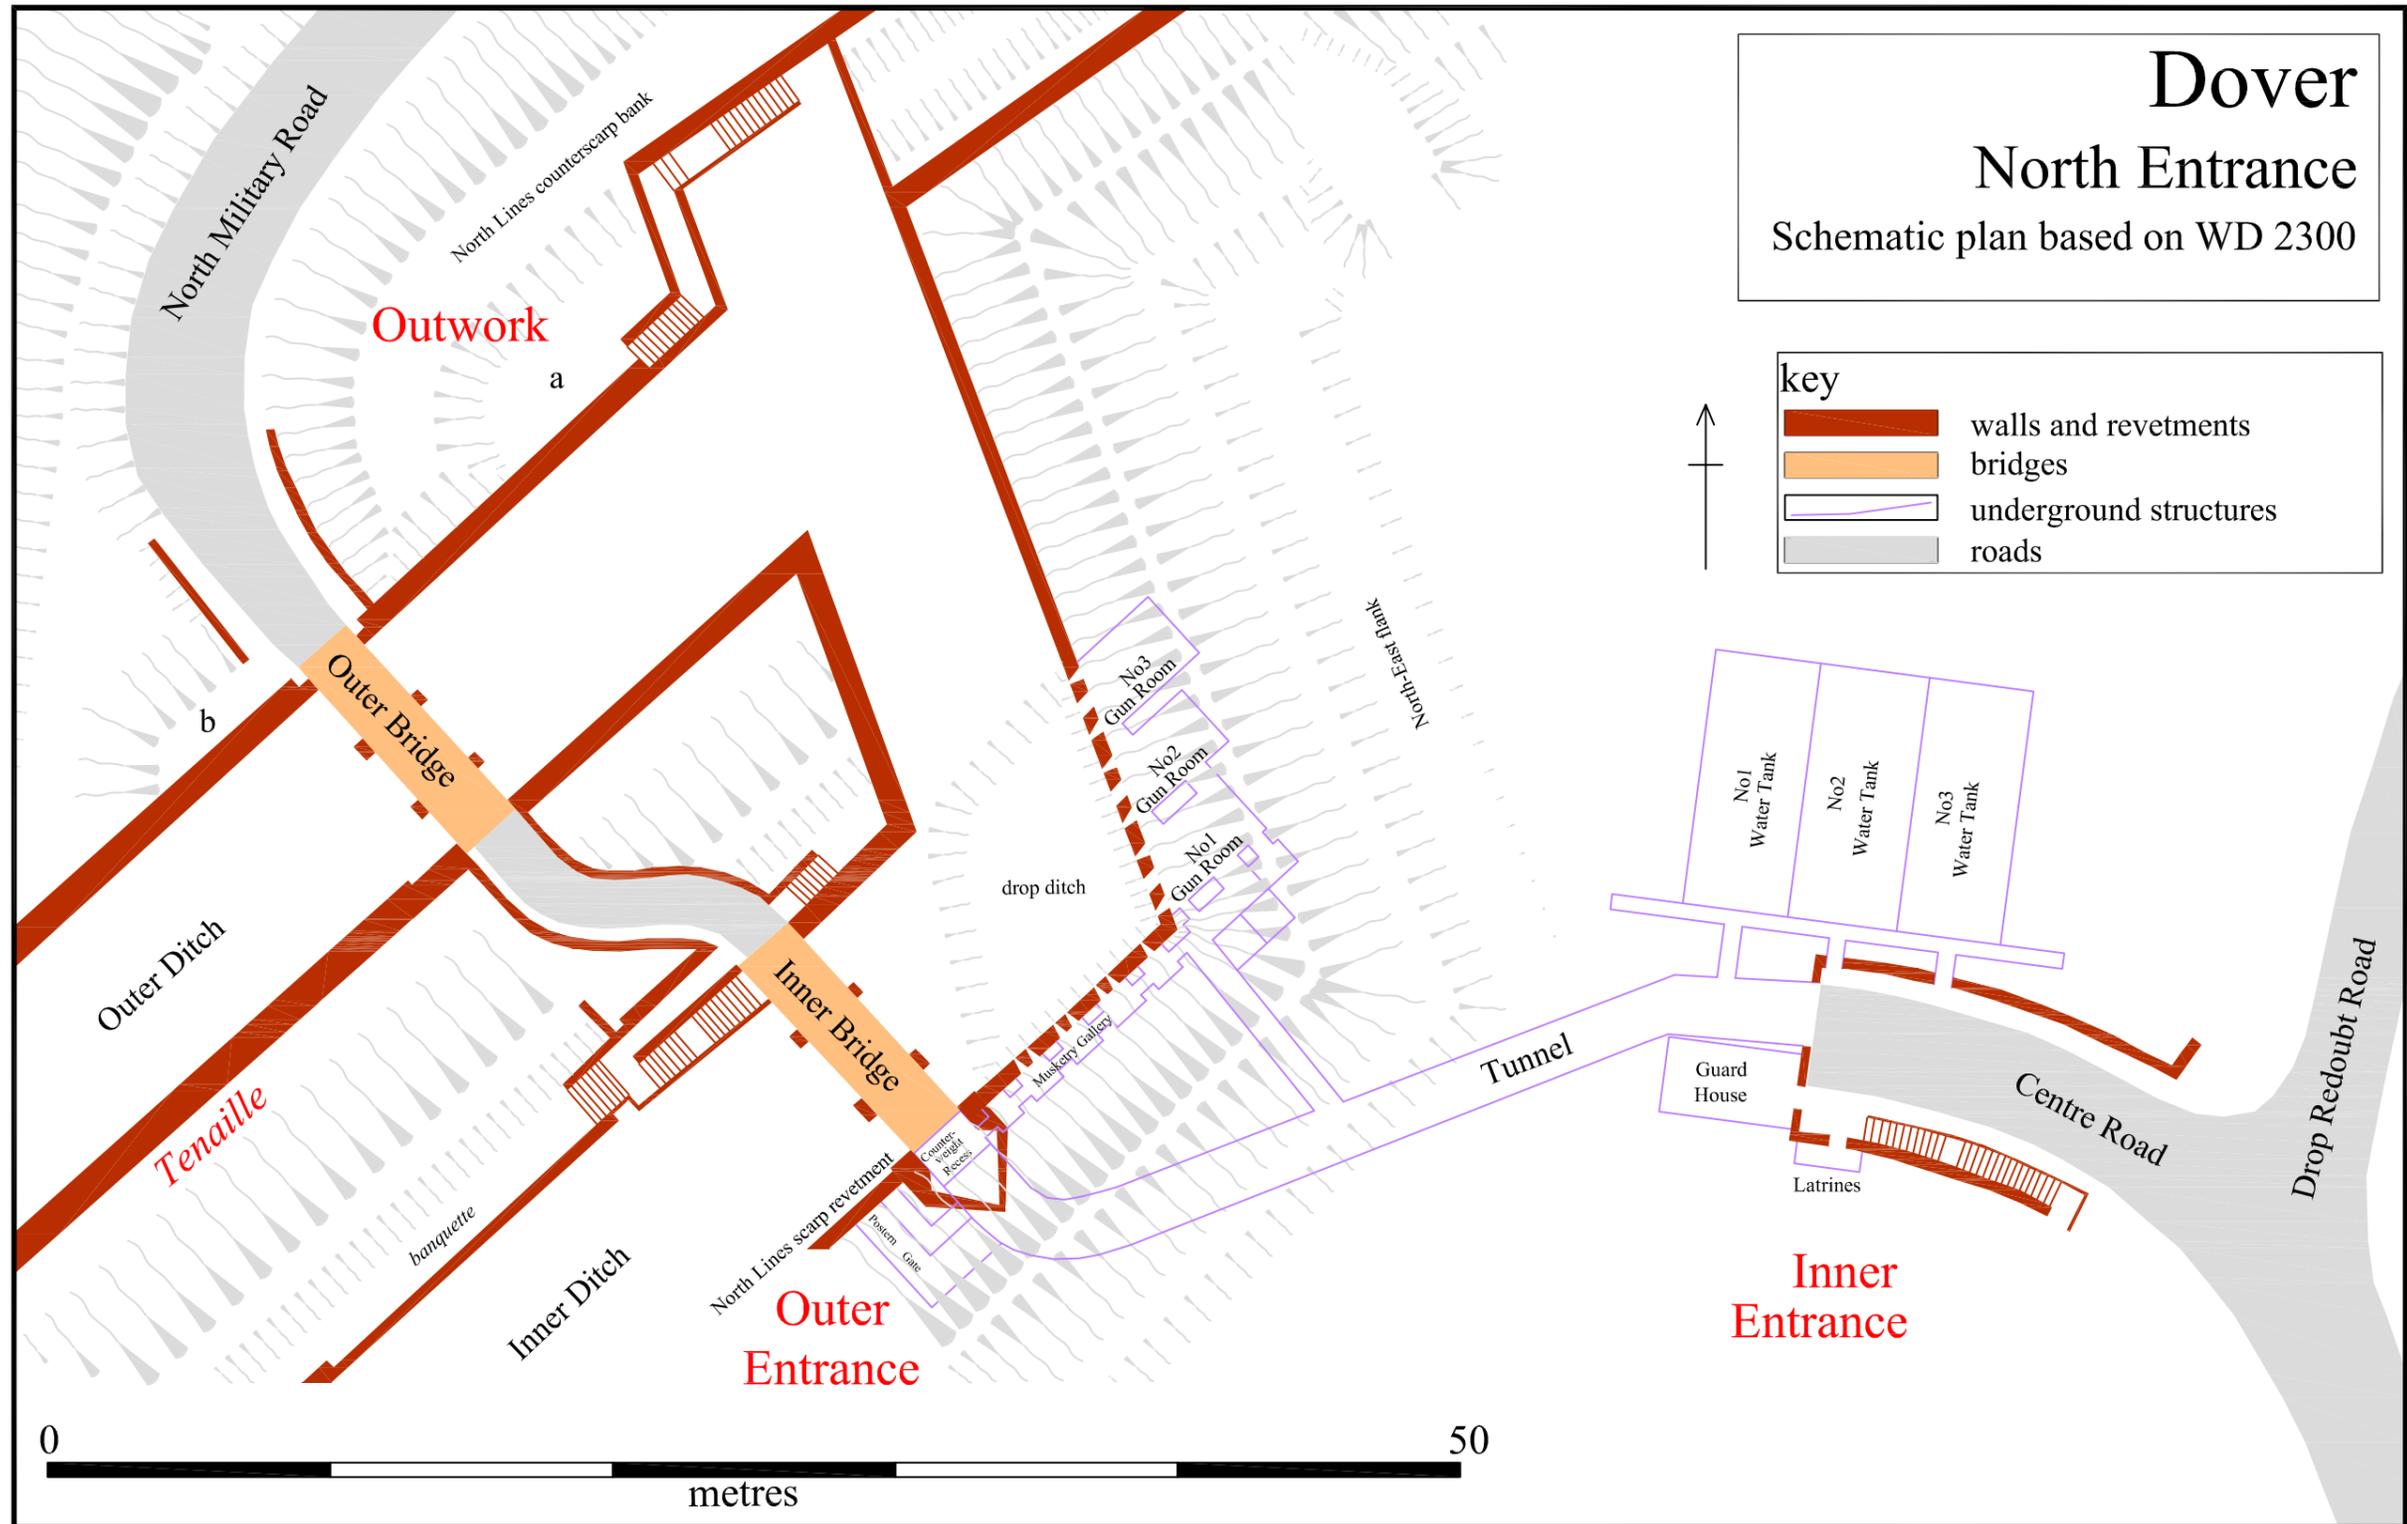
A plan of the North Entrance, based upon a plan dated 1893
